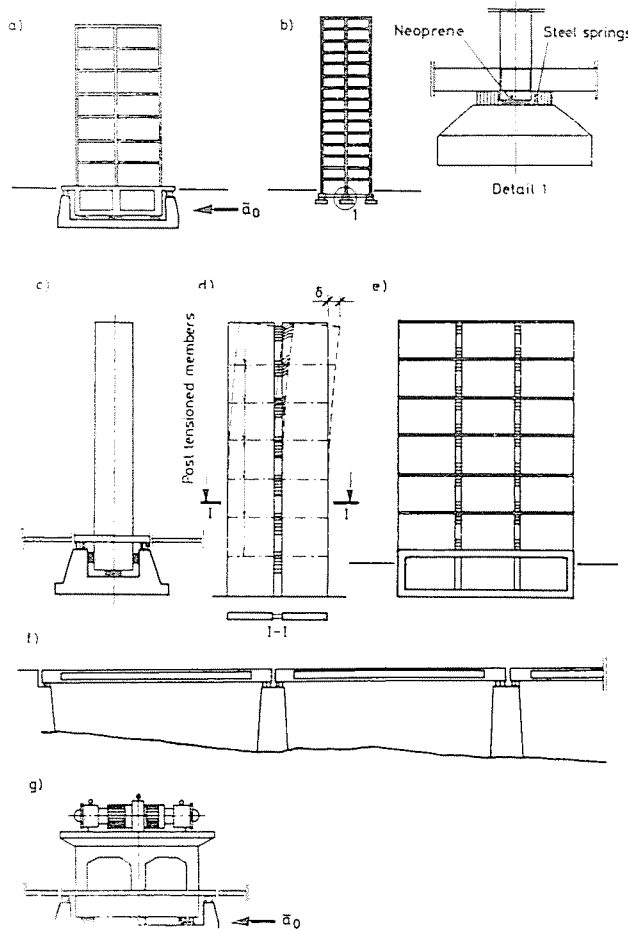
Practical applications; a) Damping of rigid buildings; b) Solitary foundations; c) Damping of towers; d) Shear wall joints; e) Shear connections of precast wall units; f) Bridges; g) Damping of turbine foundations
